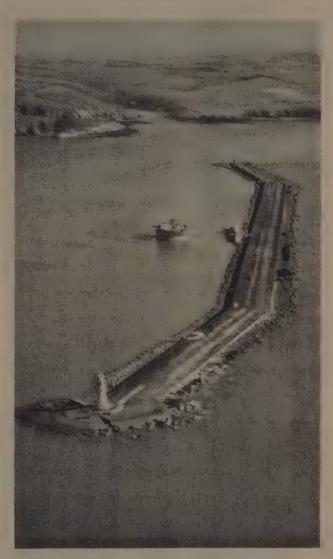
Aerial View of Plymouth Breakwater, taken from the west at low water.
